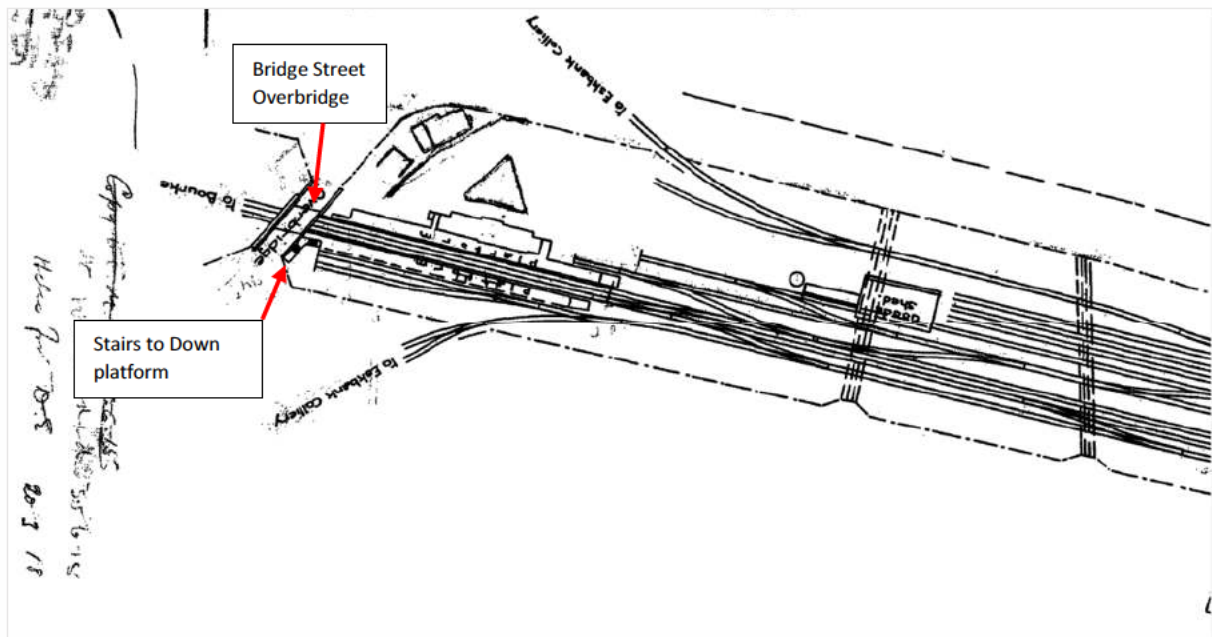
Detail from 1910 plan of Eskbank Station Arrangements (Source: Sydney Trains Virtual Plan Room EDMS CV0070731)
